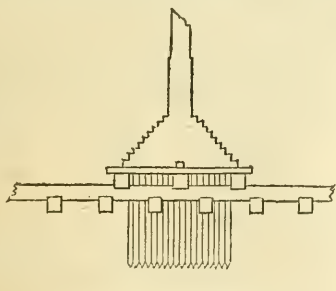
Section of the foundation for the walls of the Leyden station.
